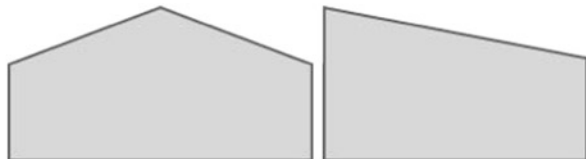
Saw-tooth roof and gable roof covering buildings at Kaduna Textiles Limited (Source: Author's field work)
